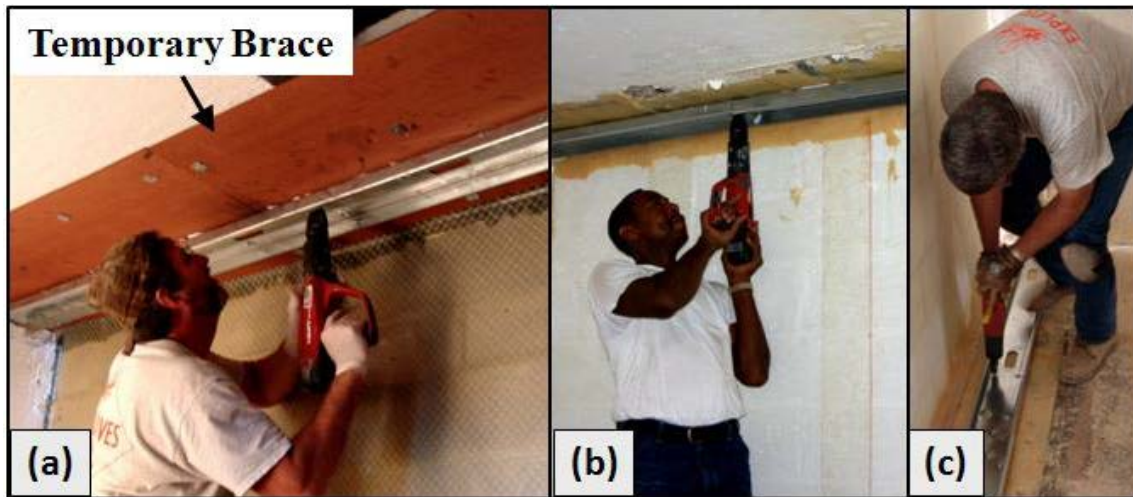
Anchor plate. (a) Mechanical anchorage placed over temporary bracing. (b) Ramset and nails used to secure thin steel stud channel to top support. (c) Bottom support secured completing anchor System 8.
